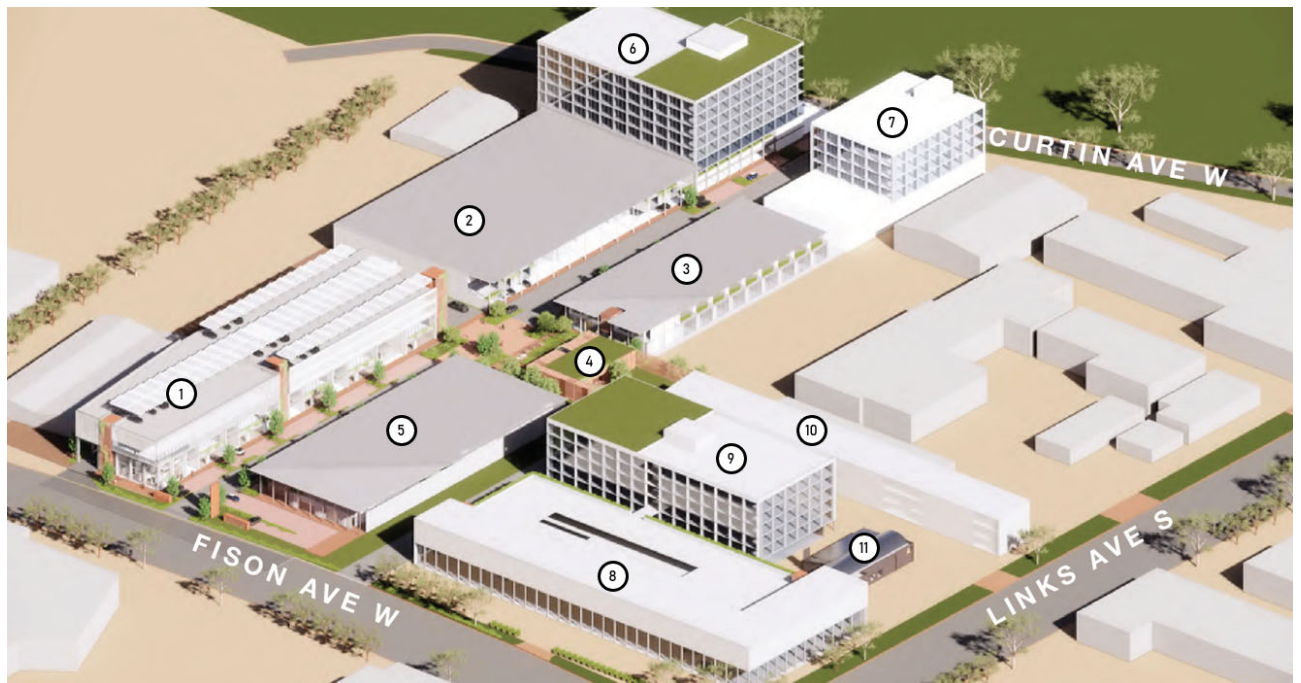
Building numbers and indicative form (note – building parameters subject to provisions specified in section 5)
